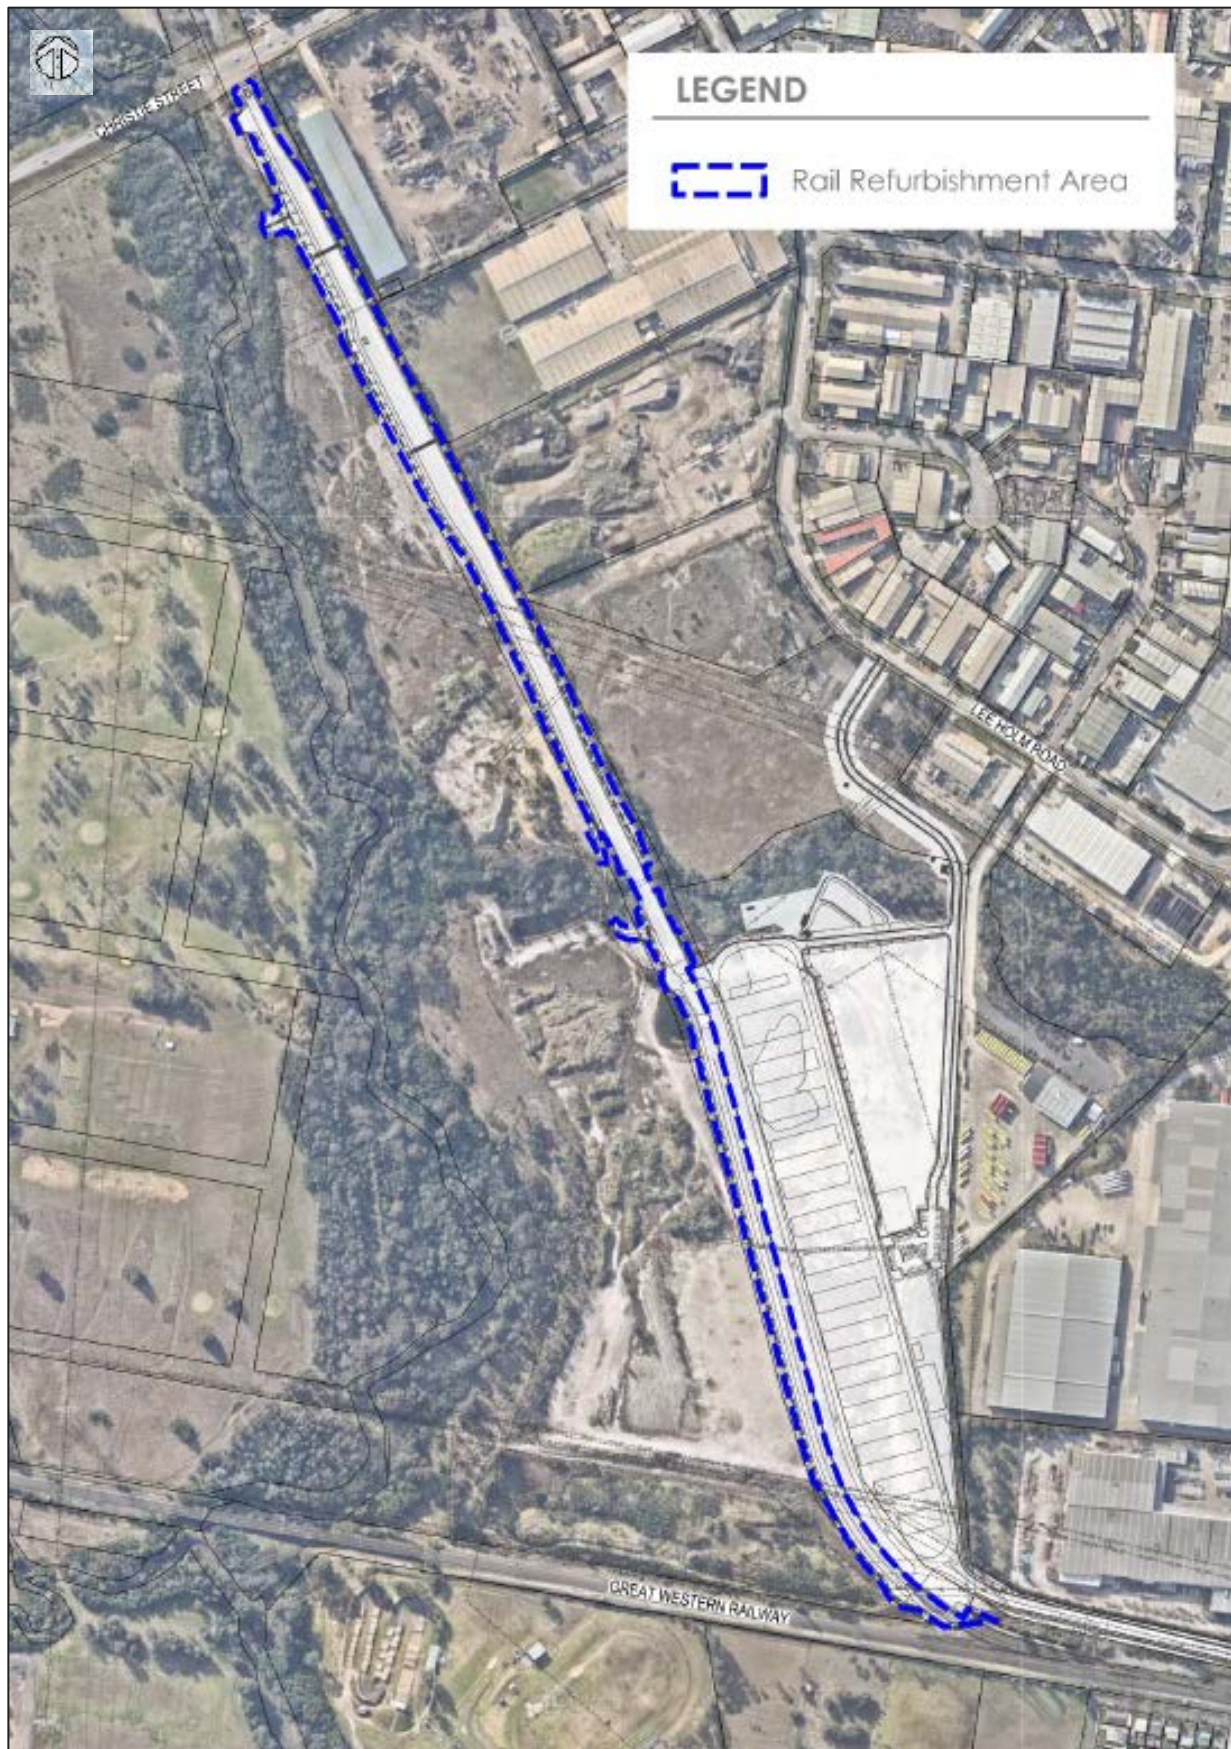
| Rail refurbishment works design area (source: Applicant's Modification Report)
